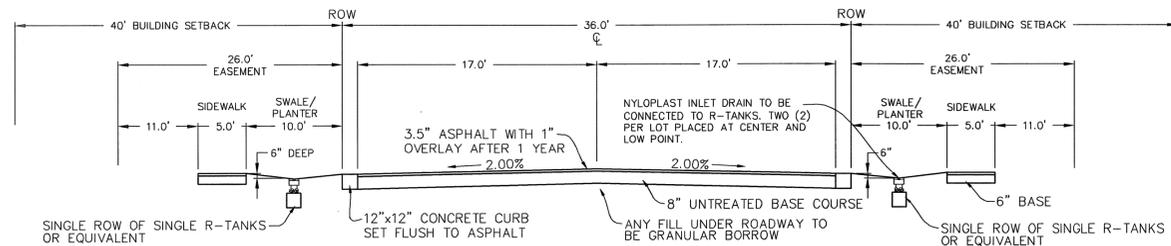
DETAIL - TYPICAL 66' RIGHT-OF-WAY STREET SECTION
